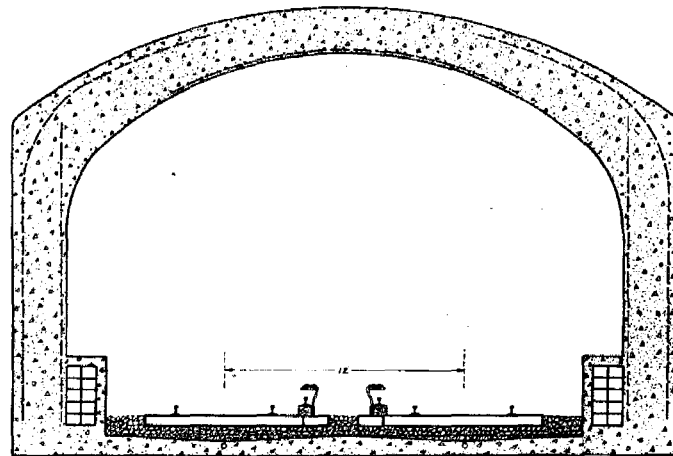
Semi-elliptical type tunnel—Typical cross-section.
